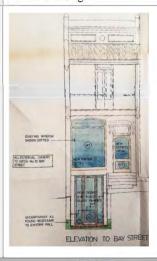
Architectural plans by architect Espie Dods for alterations to the street frontage, dated 1978 (BA 932/78)
